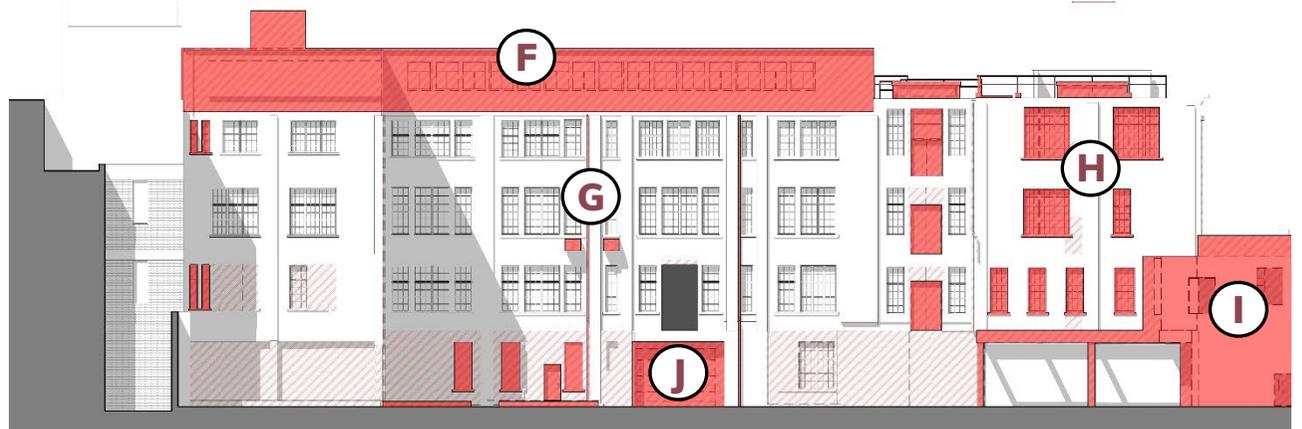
Proposed Demolition, Courtyard Façade, Sorting Office
